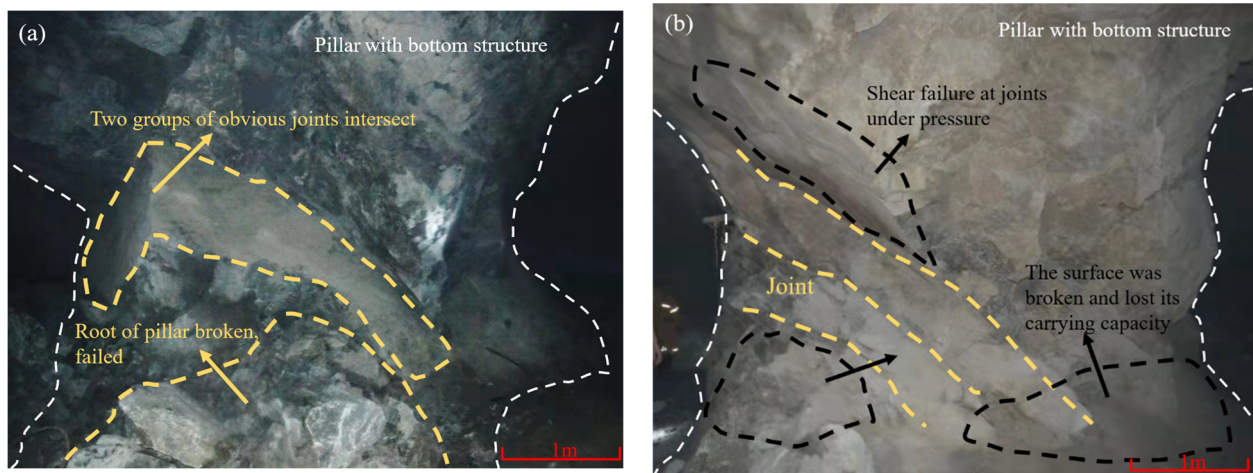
Typical pillar damage. (a) Pillar joint failure (b) Pillar root failure.
